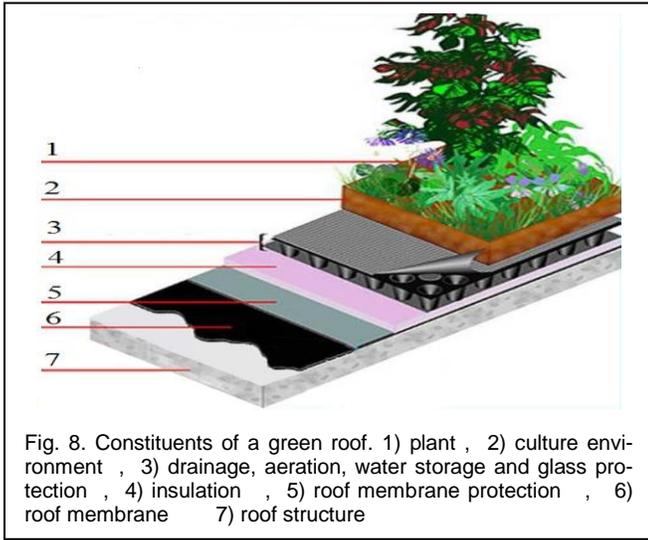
Constituents of a green roof. 1) plant , 2) culture environment , 3) drainage, aeration, water storage and glass protection , 4) insulation , 5) roof membrane protection , 6) roof membrane 7) roof structure
